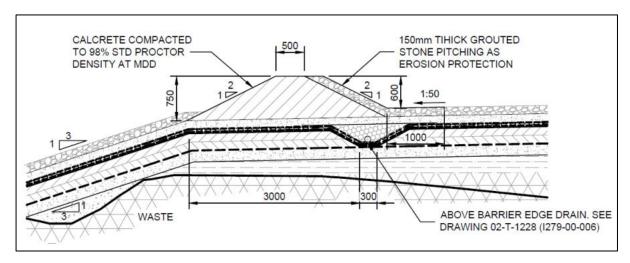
Cross sectional detail for the crest perimeter berm (Drawing 02-T-1229)
